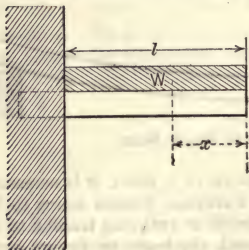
Cantilever Beam. Uniformly Distributed Load
